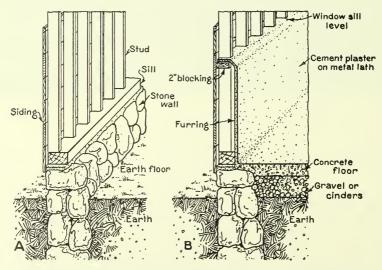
Method of rat proofing old stable, A. Concreting and plastering as shown in B makes for better sanitary conditions behind stock
